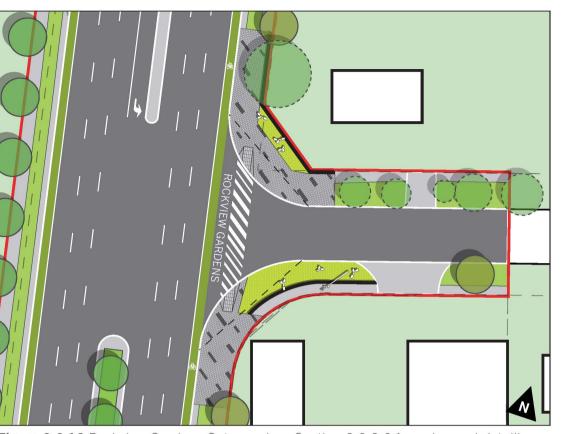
Rockview Gardens Gateway (see Section 3.2.3.2 for enhanced detail).
